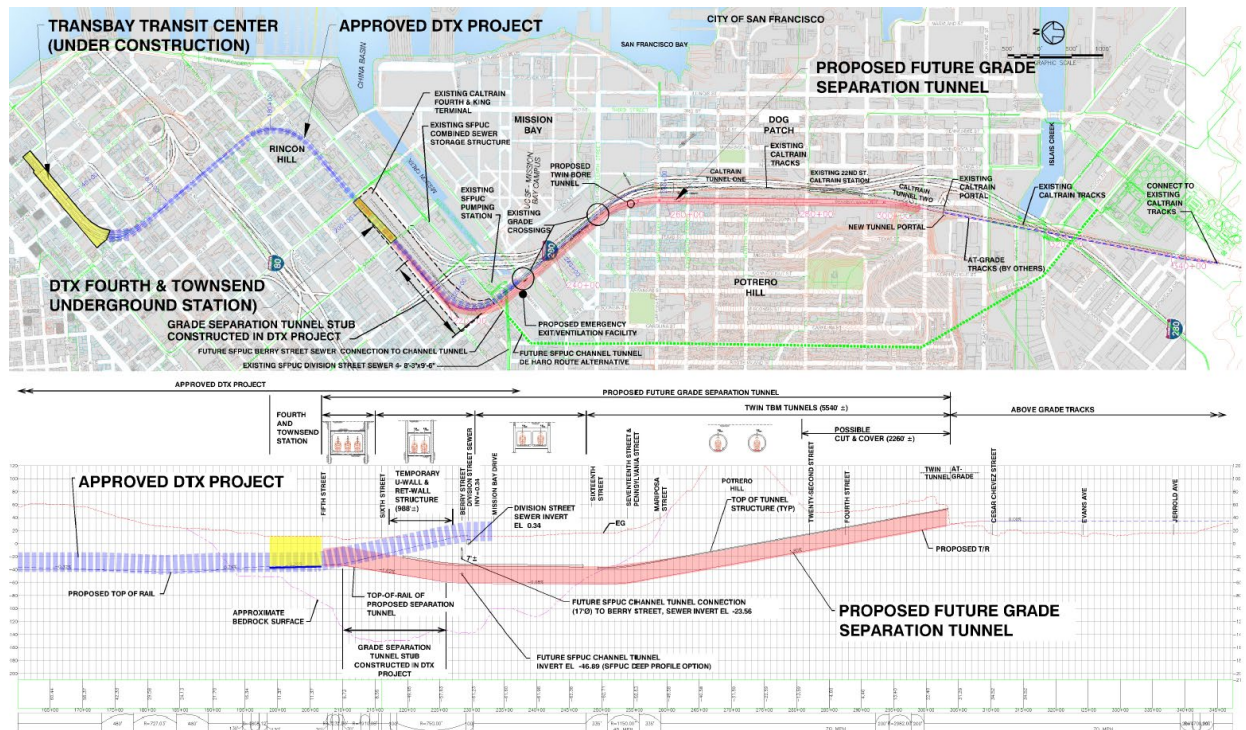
TJPA 2015 drawing of previously conceived Pennsylvania Avenue Alignment underground extension connecting through to the 4th/Townsend station.
